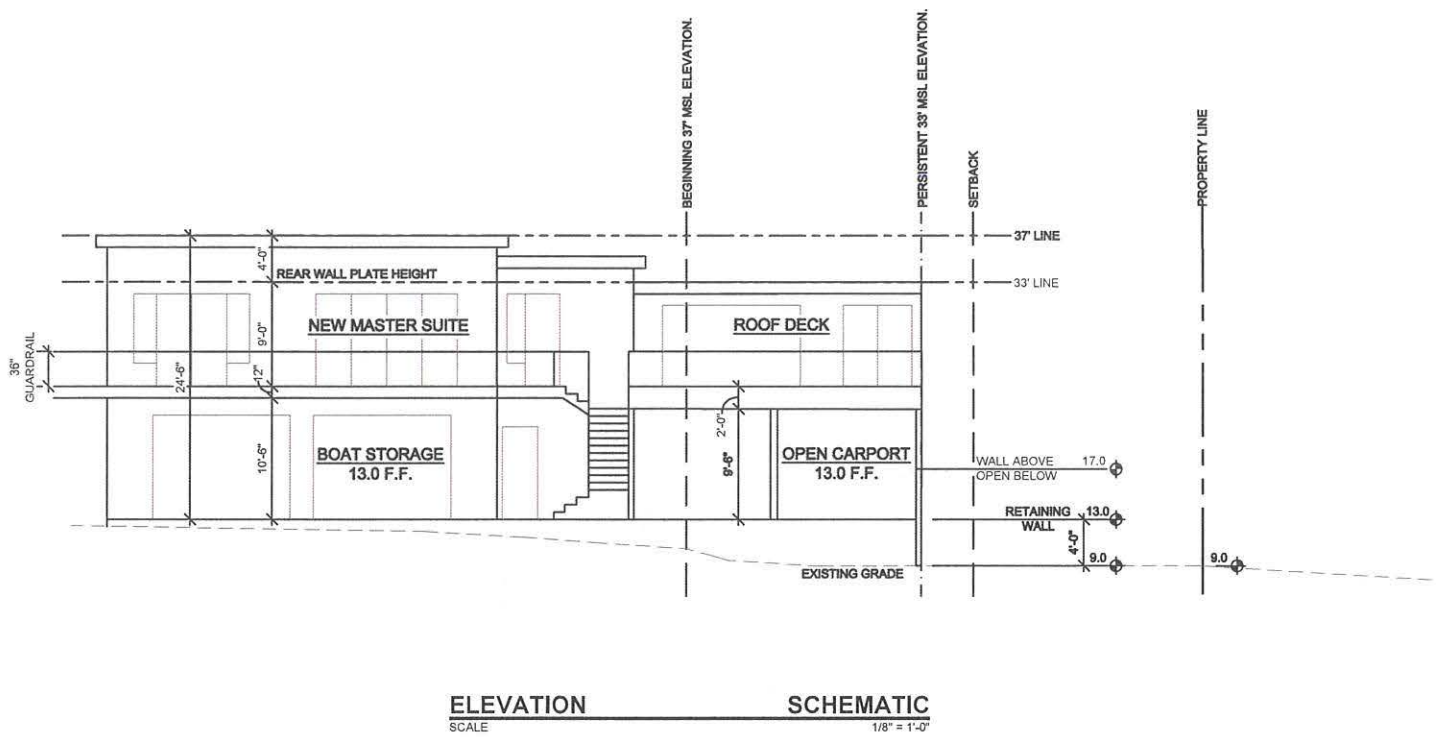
PROPOSED CONDITIONS ELEVATION SECTION
